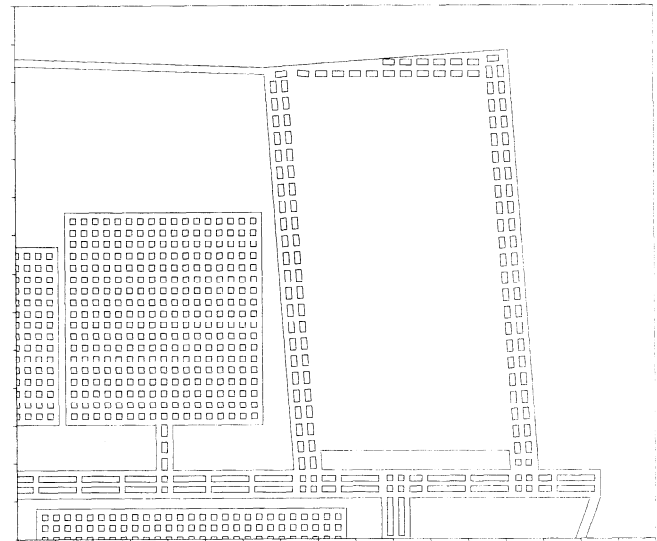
Generation of room and pillar or longwall panels.
